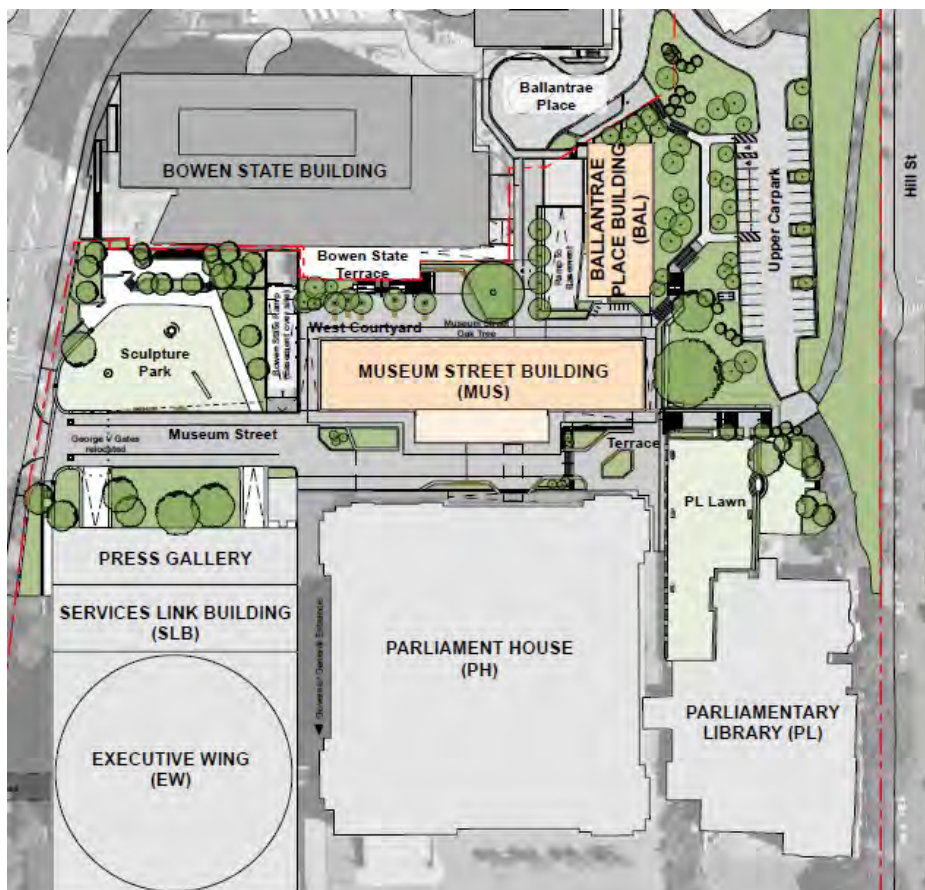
Parliamentary Precinct Landscape Plan (source: Studio Pacific Architects)
